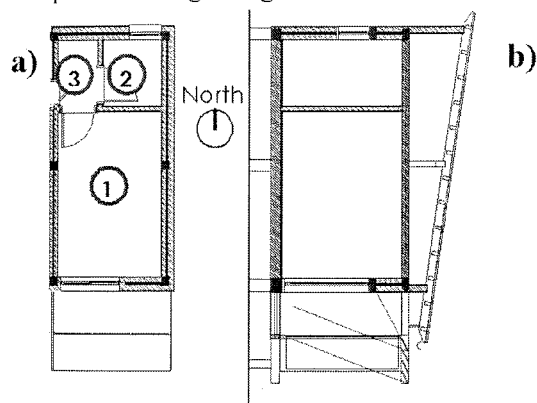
CTC drawings; a) floor plan; b) cross-section.
